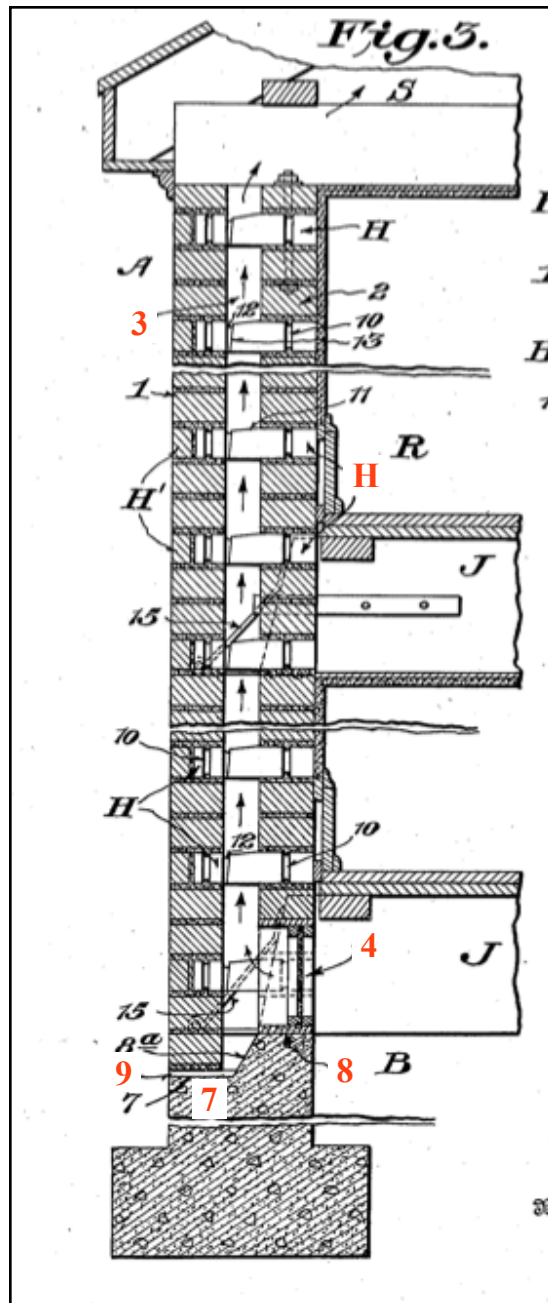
Detail of Wood's 1938 patented cavity wall assembly. Grooved brick headers (H) tie the double wythe wall across the cavity air space (3) and are designed to direct water down through the cavity towards the stepped concrete shoulder (7, 8). The inclined shelf is intended to facilitate drainage away from the wall, through weep holes (9) at the base of brick facing. Interior air is connected through vents (4) at the basement space and near the ceiling of individual rooms (seen at 5 in Figure 3.12).
